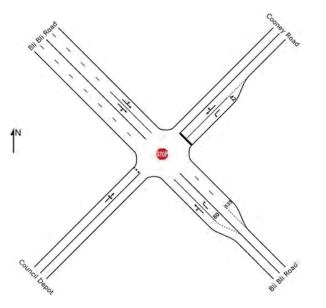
Bli Bli Road / Cooney Road Intersection Configuration
